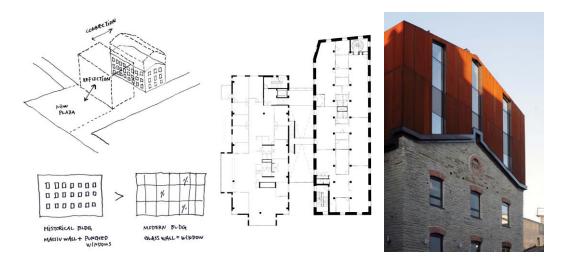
Design diagram, second floor plan, outer view from the left. Drawings courtesy of HGA and photo courtesy of Martin Siplane.
